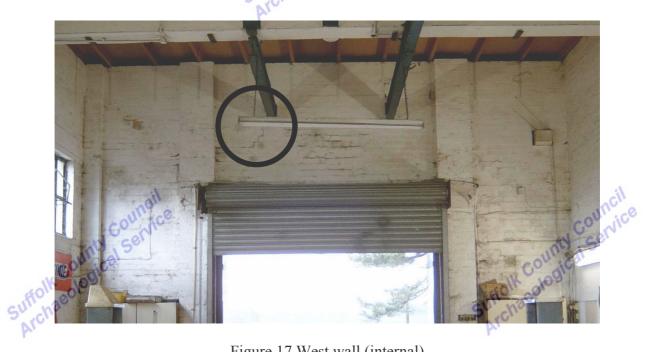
West wall (internal) (area of cracking highlighted by the circle)
